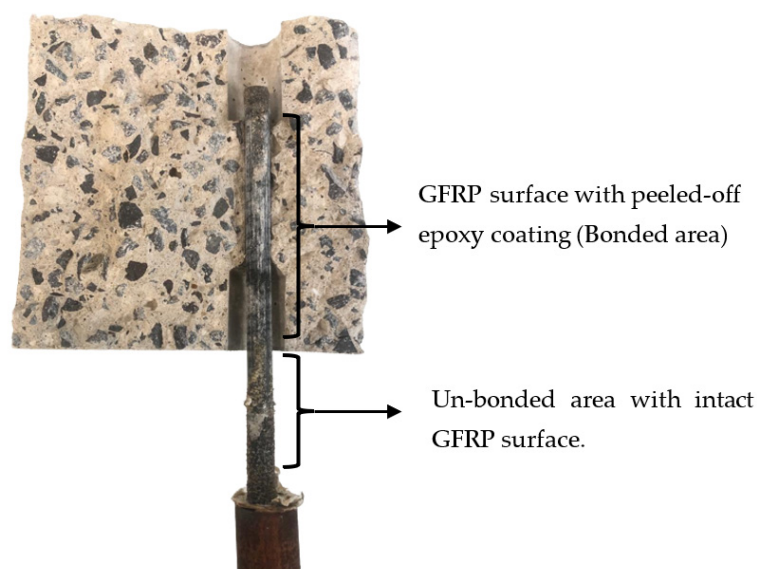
Cross-sectioned specimen showing pull-out failure effect on GFRP sand-coated bar.
